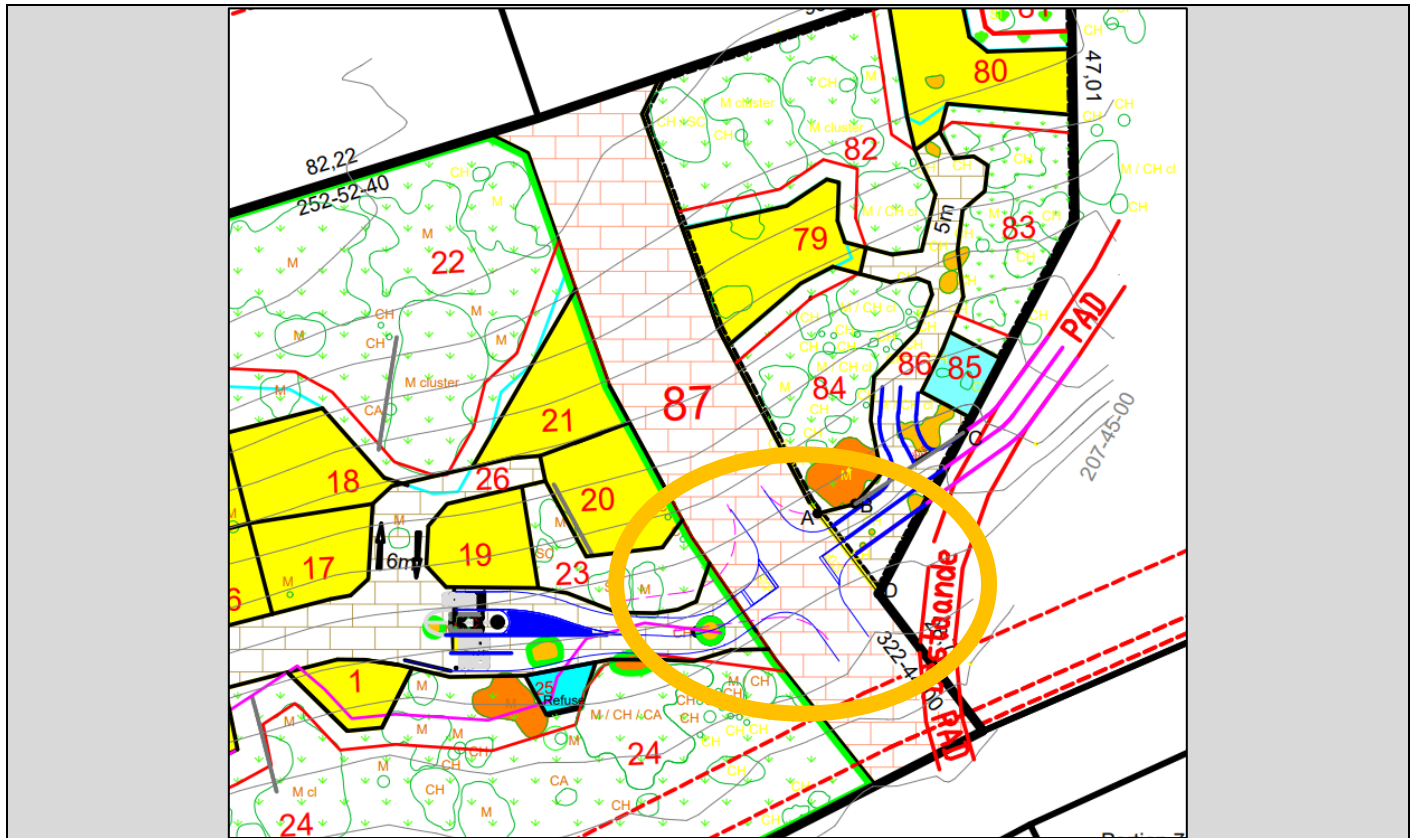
Proposed access from Souwesia Avenue that bisects the Remainder of Erf 2841 (FormaPlan, 2024).
